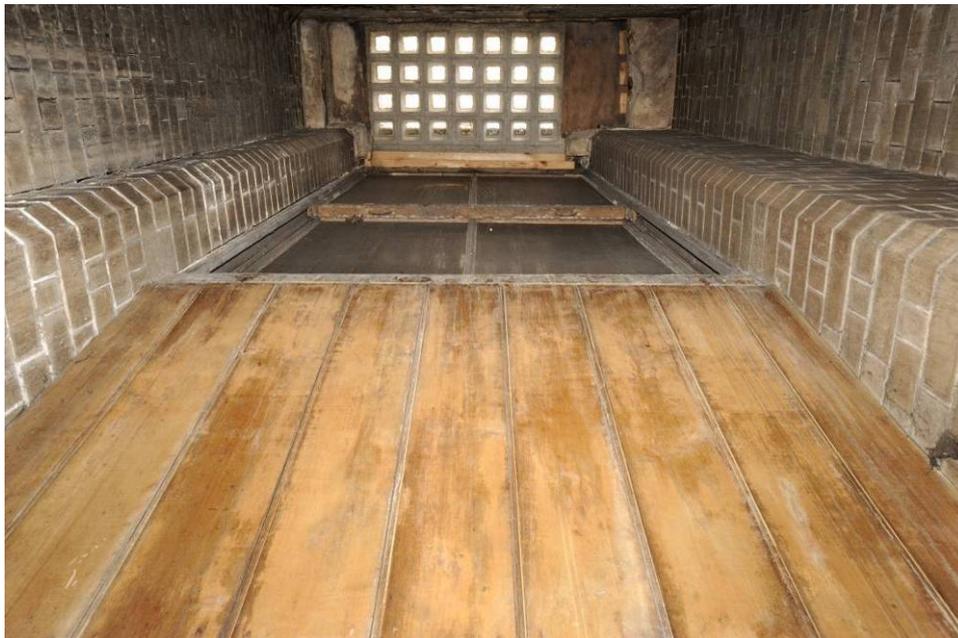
The southern light well of the Broad Street Avenue facade, looking up and to the west
